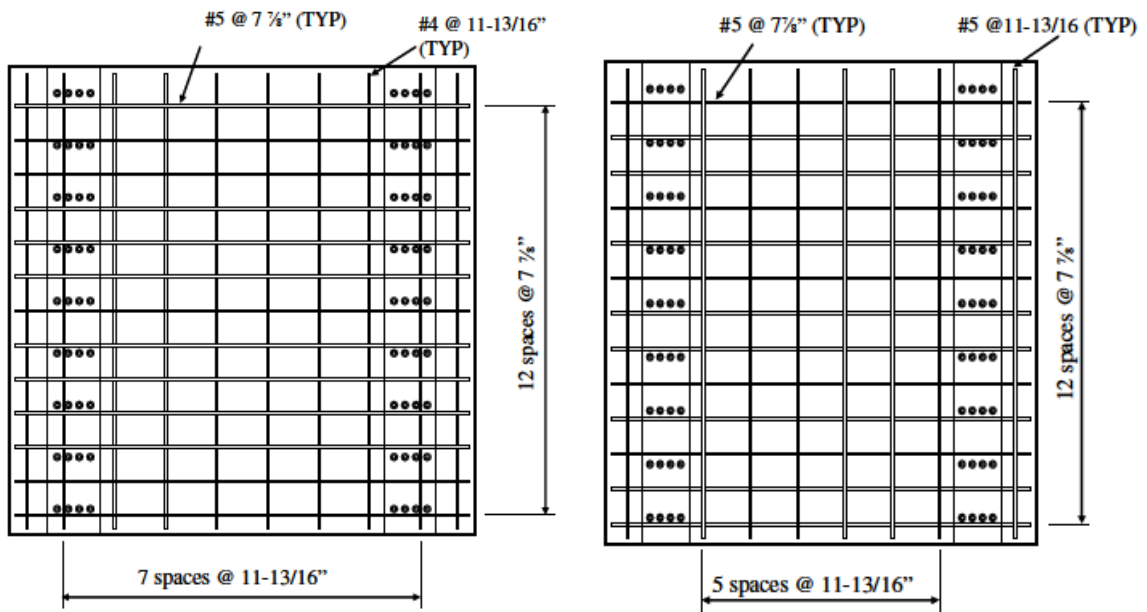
(a) Top reinforcement and (b) Bottom reinforcement in restrained shrinkage specimen for medium scale slab experiment (Frosch, 2006)
